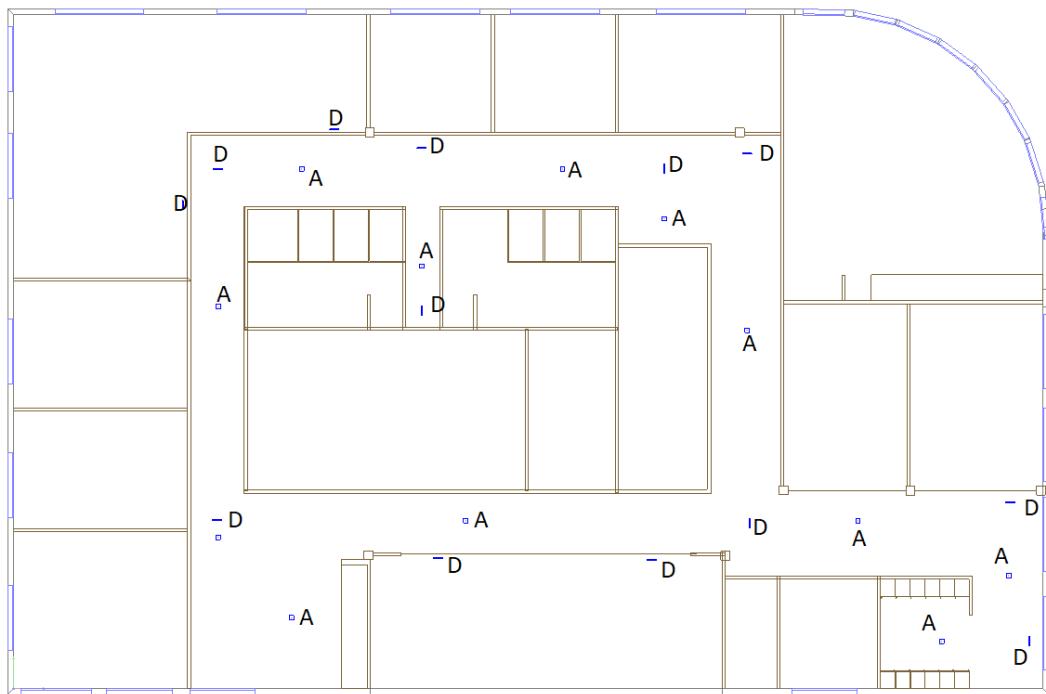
Luminaire layout for Floor 2 emergency lighting
